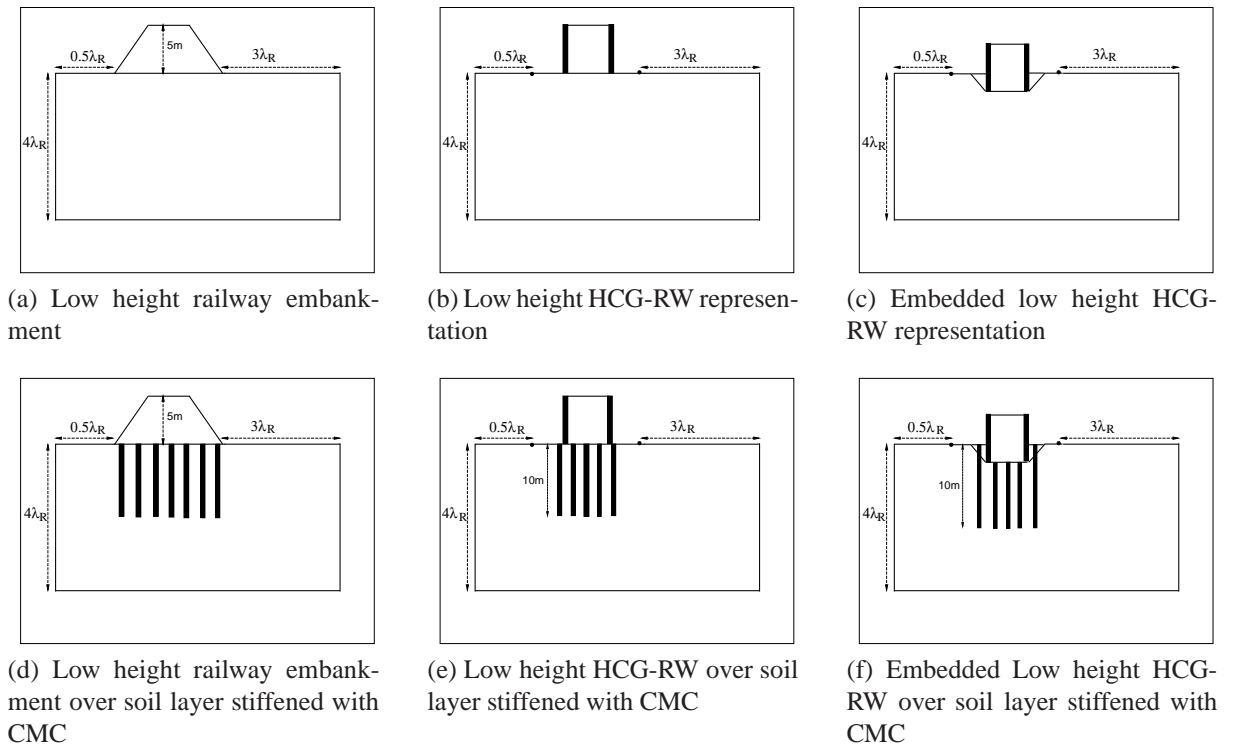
2D configuration of railway embankment over soil layer resting on bedrock.
